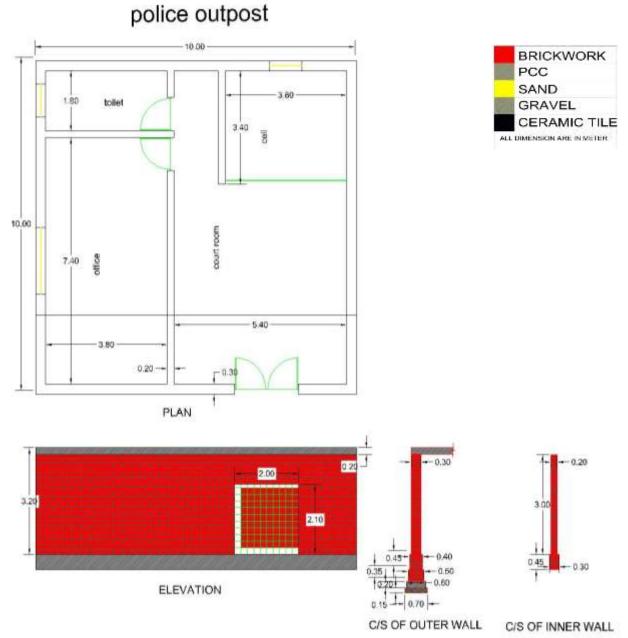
Plan, Elevation & Cross Section of Police Outpost
